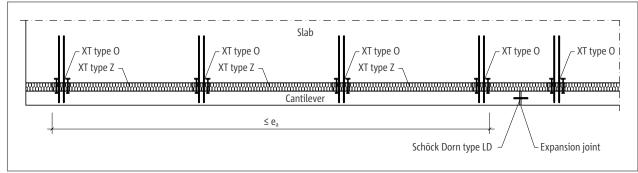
Schöck Isokorb® XT type O: Expansion joint arrangement
